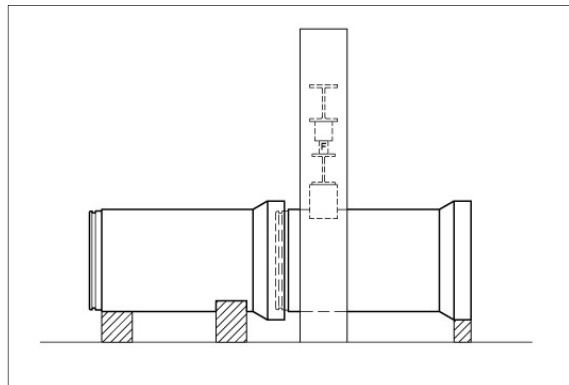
Joint Shear Test w/Three-edge Bearing Test Frame
